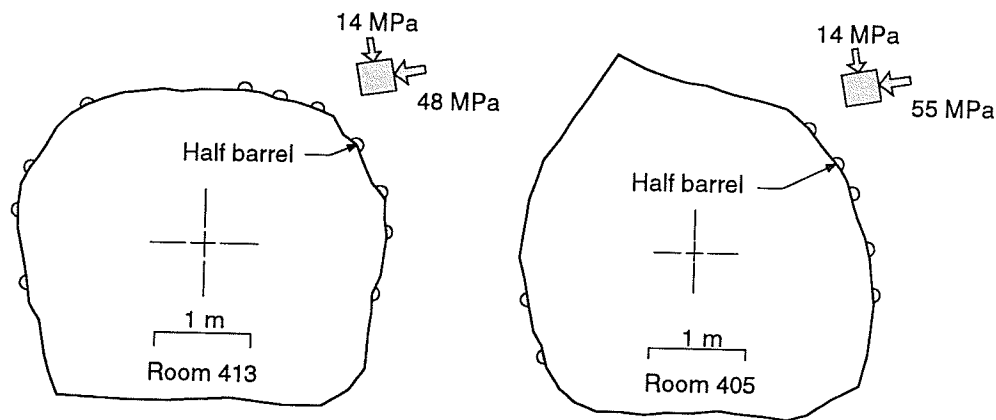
As-built profiles of Room 413 and Room 405. Note the classic v-shaped notch in the roof of Room 405 indicating spalling-type failure.
